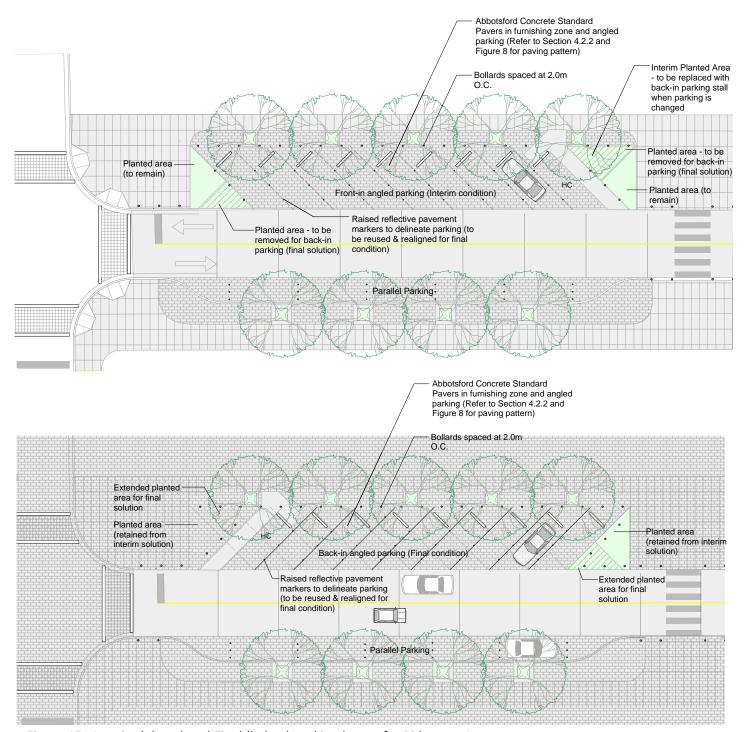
Interim (above) and Final (below) parking layout for Ridgeway Avenue
